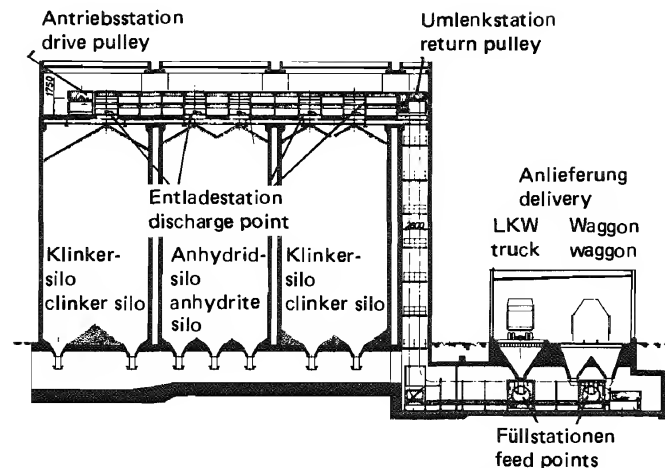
Swing bucket elevator for the simultaneous handling of several materials
